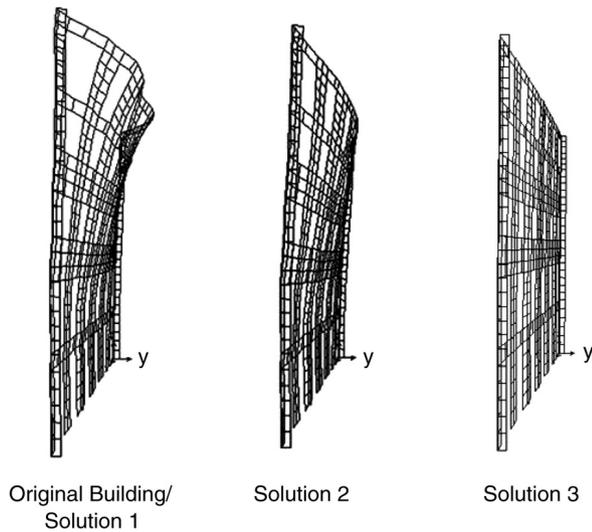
Deformed shape of the front façade of the building before and after being strengthened with Solutions 1, 2 and 3 (same scale factor).
